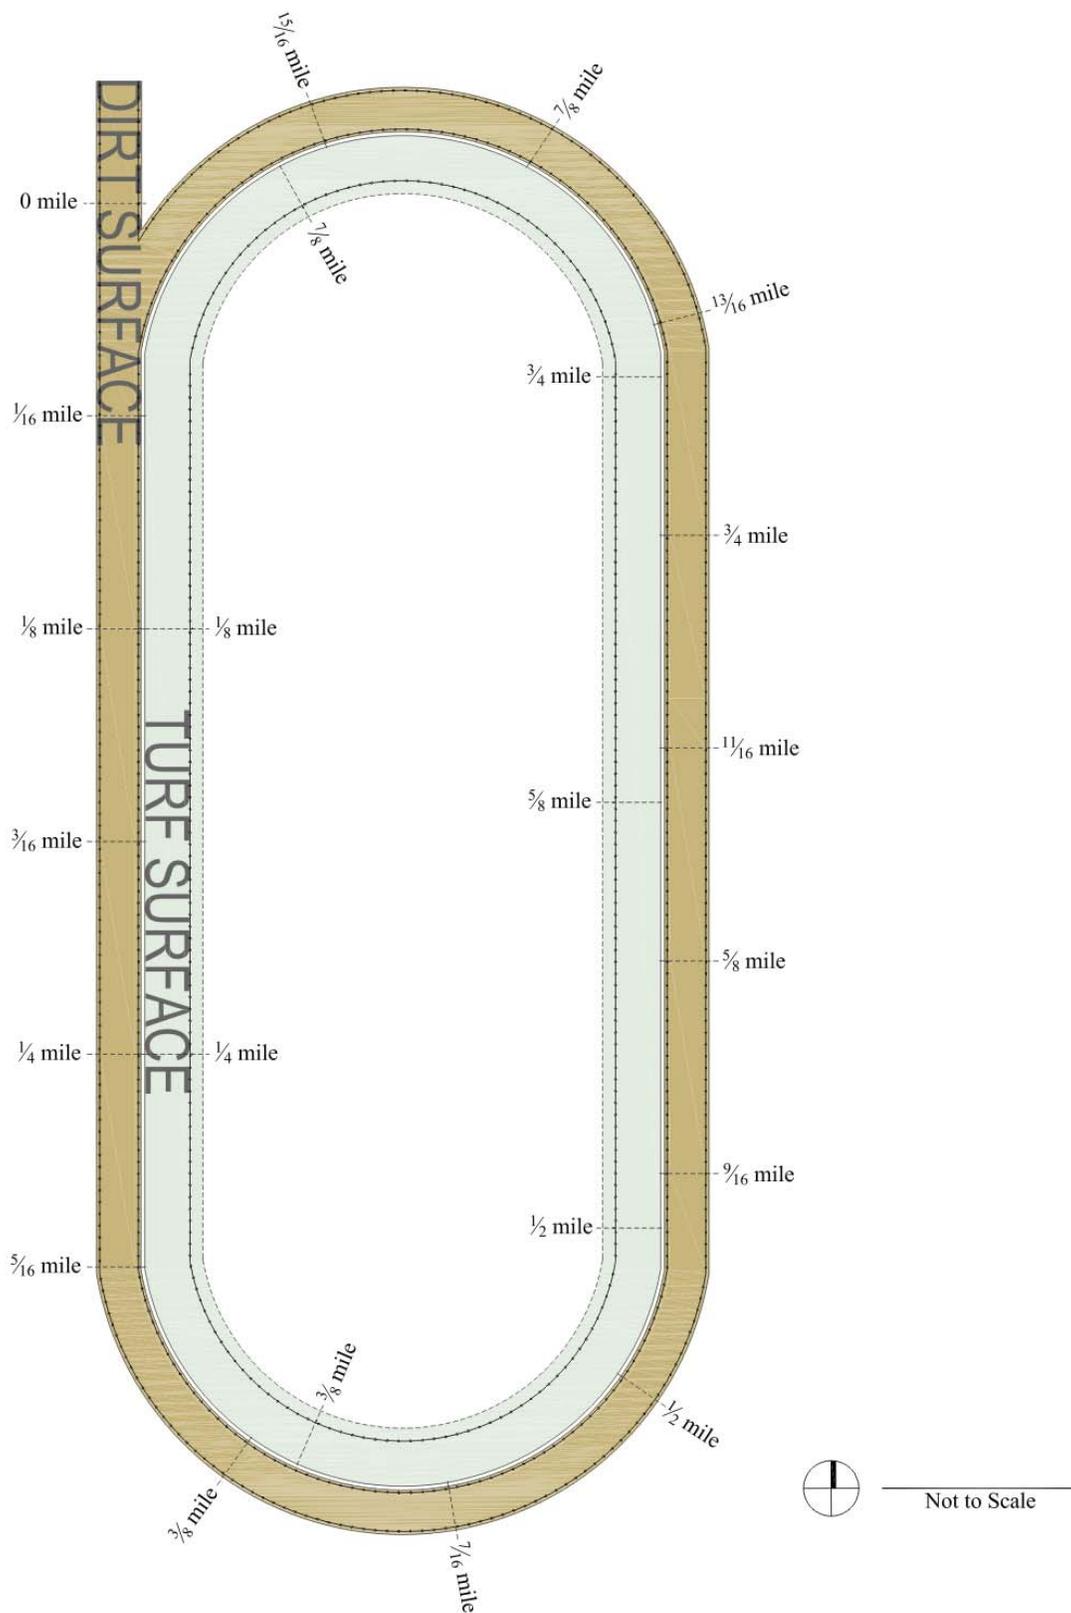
Plan of conventional dirt and turf surfaces at Eddie Woods Stables.
